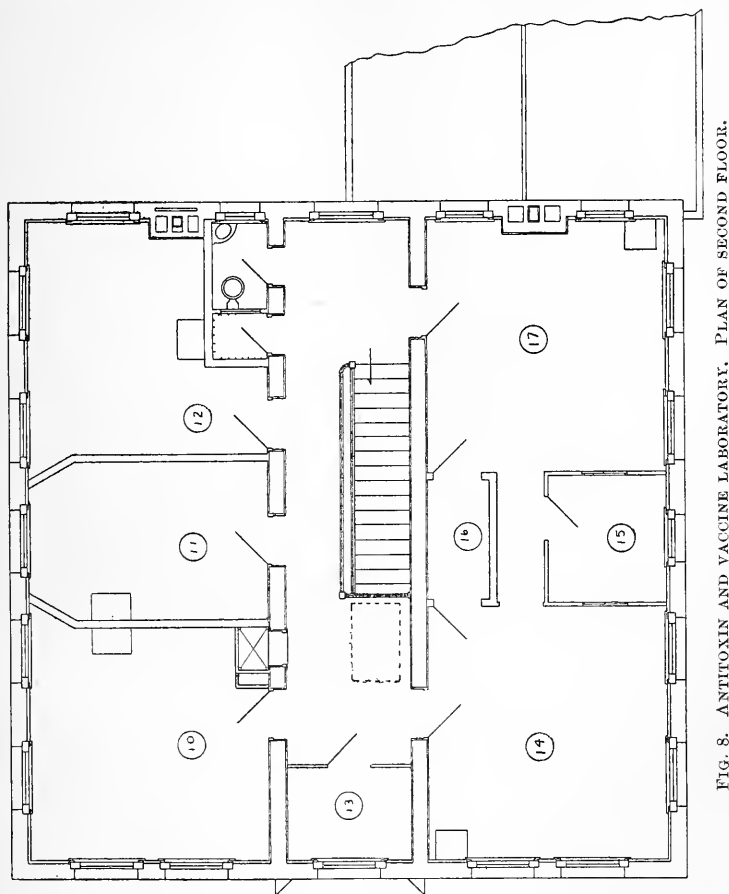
ANTITOXIN AND VACCINE LABORATORY. PLAN OF SECOND FLOOR.
